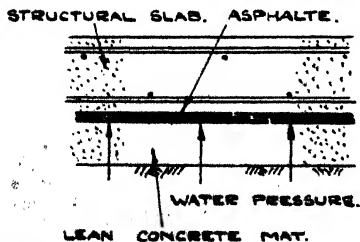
STRUCTURAL CONCRETE SLAB FORMING LOADING SLAB
